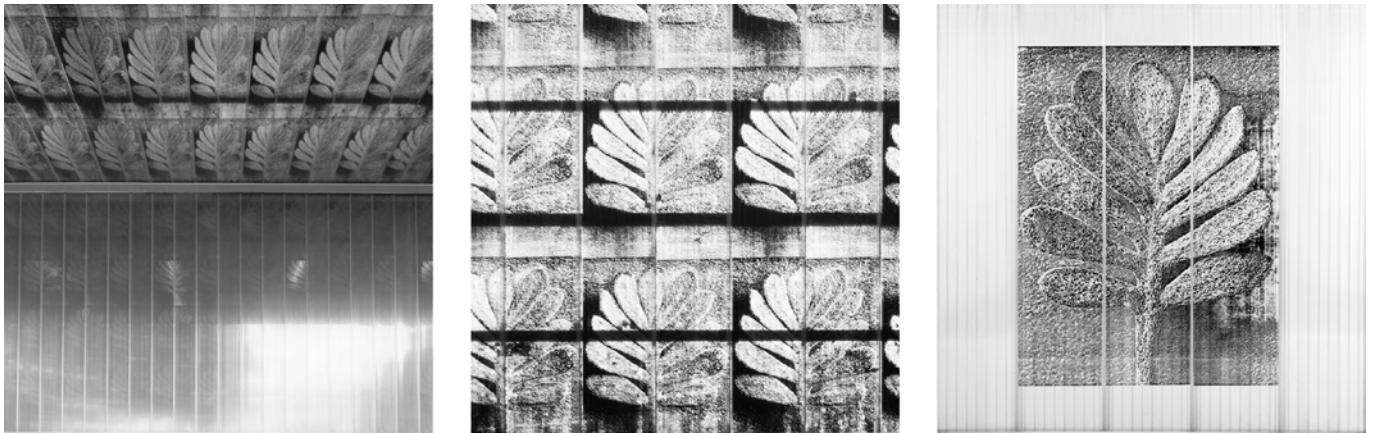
Ricola factory and warehouse in Mulhouse, designed by Jacques Herzog and Pierre de Meuron, building elevation, texture and texture tile.
